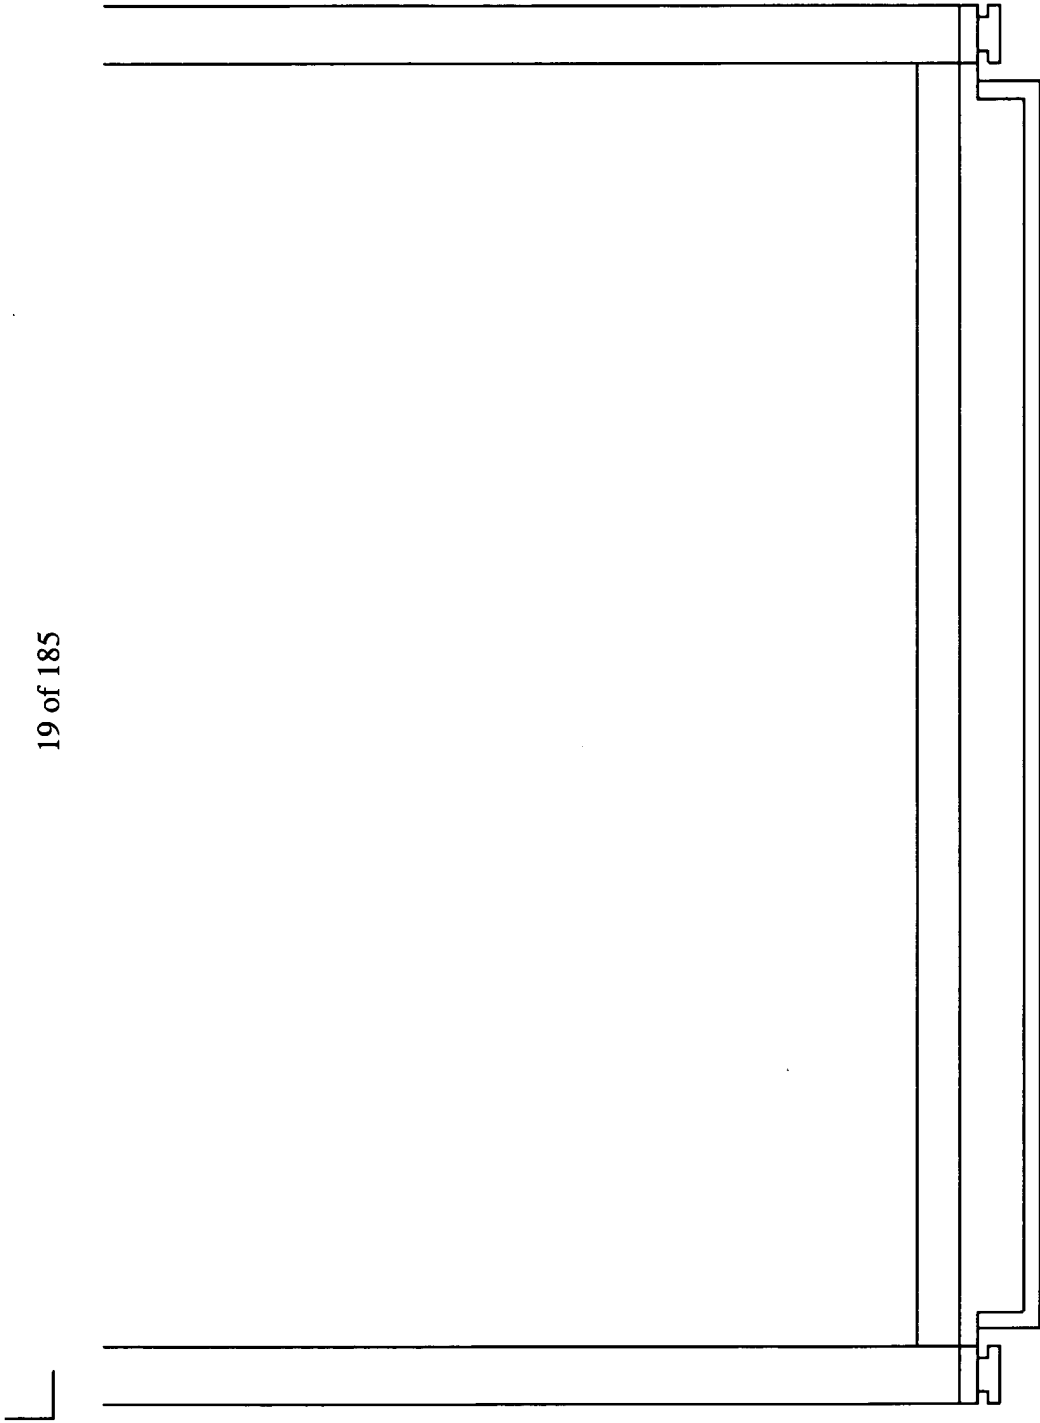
A: Top view of the right end of a ceiling frame (40 foot collapsible cargo container)
